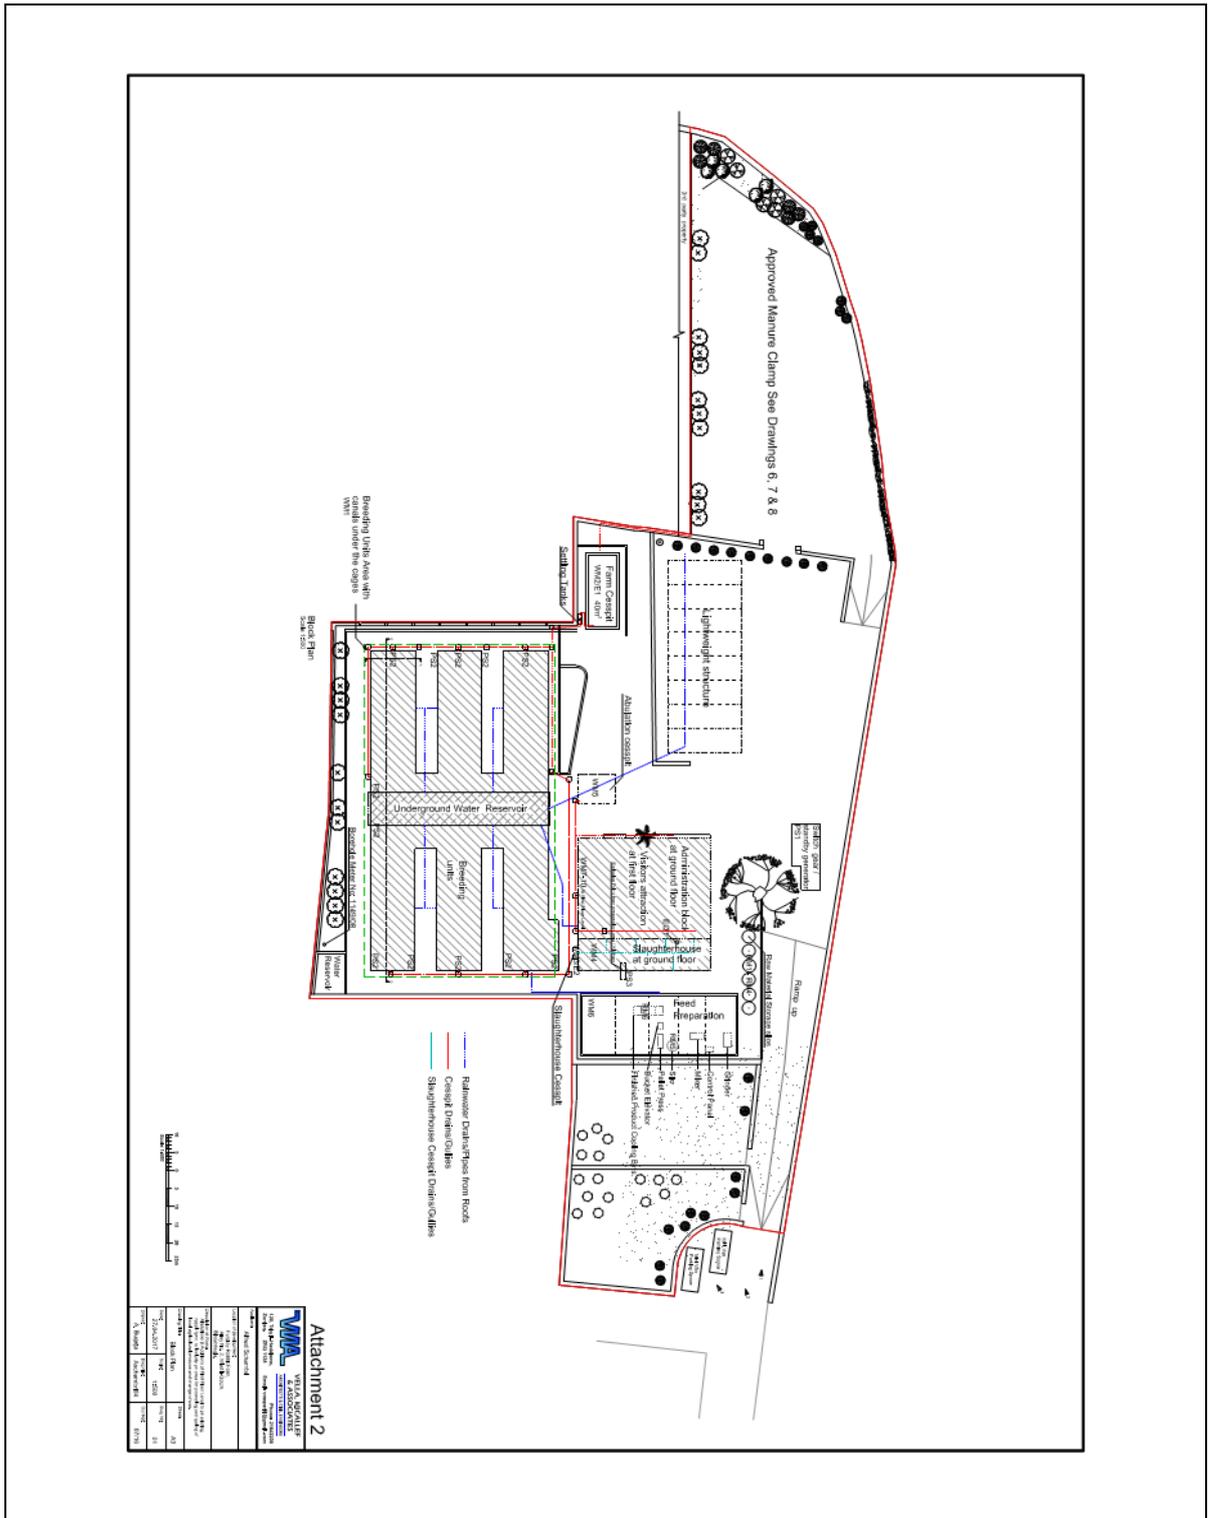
site layout plan of the permitted installation The extent of the site boundary is indicative and shall not be used for interpretation purposes
